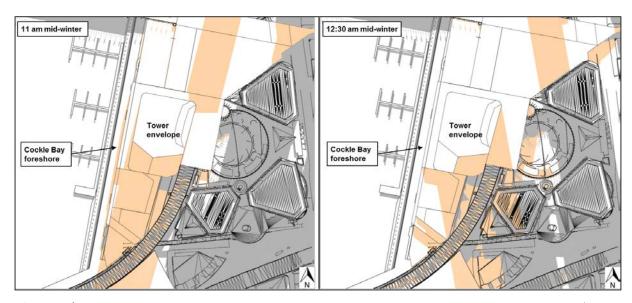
| Shadow diagrams indicating the overshadowing resulting from the building envelope during mid-winter (based on Amended EIS envelope design) (source: Applicant's Amended EIS)
